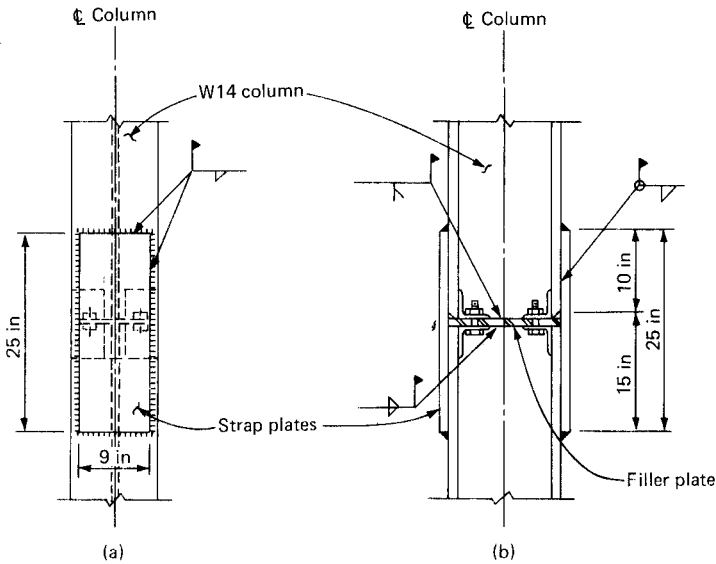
Splice detail for field correction of column lengths. (a) Elevation; (b) section.
